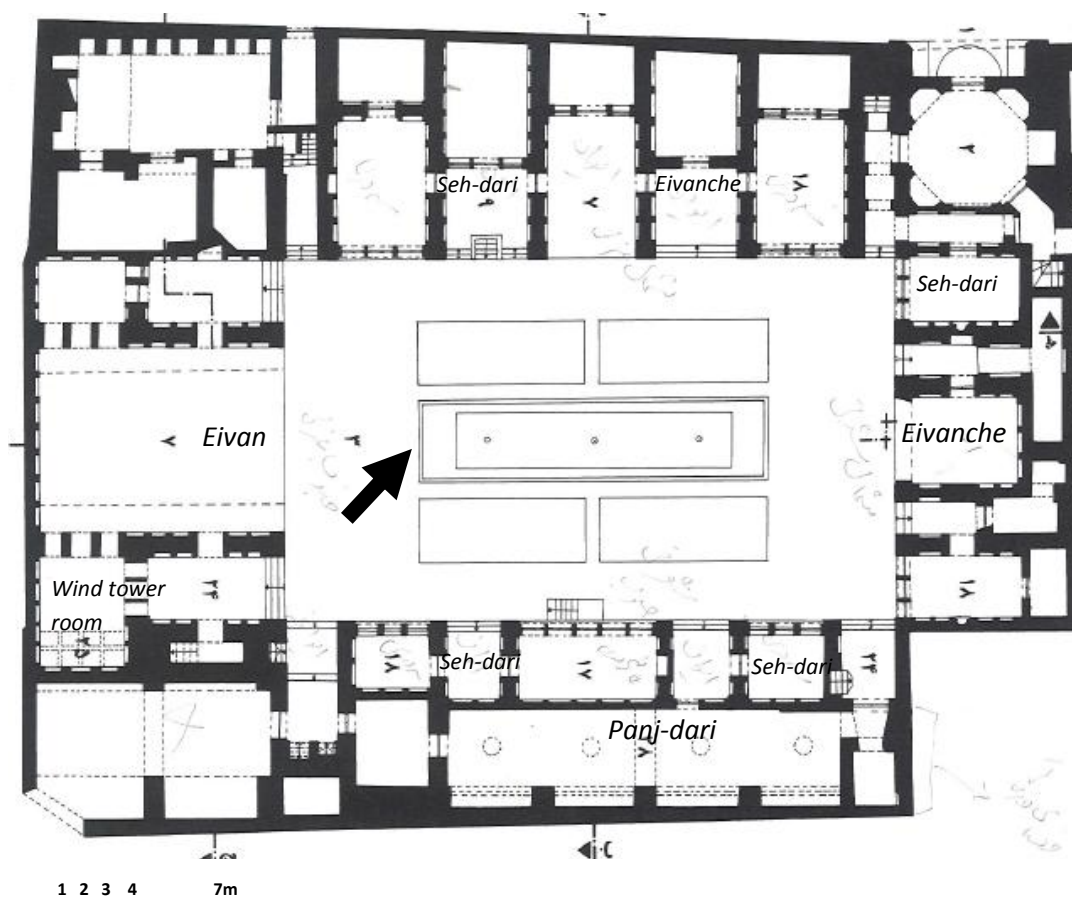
Lari house Plan (Ganjinmaeh, 2005)
